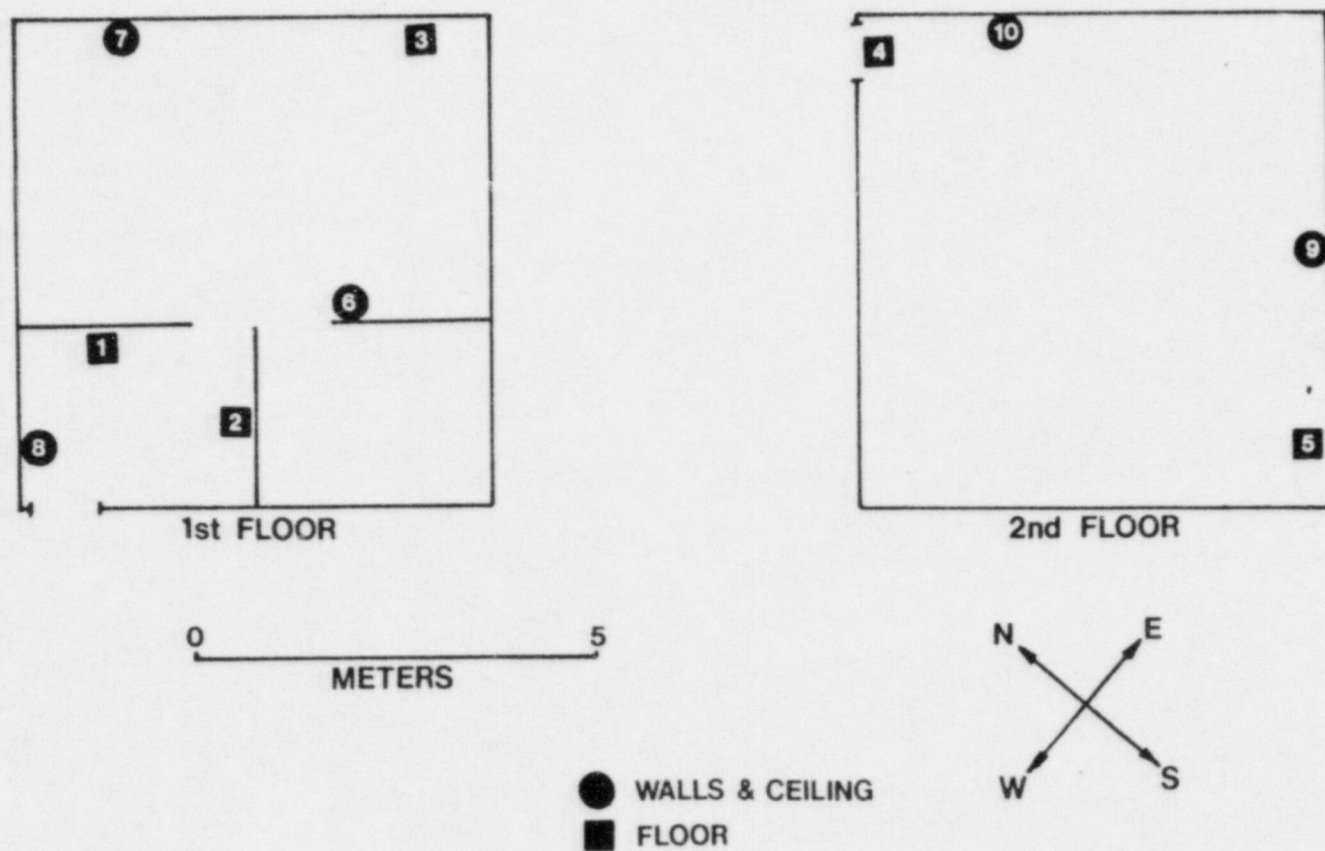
Floor Plan of the Office Building Indicating Locations of Measurements and Smears
